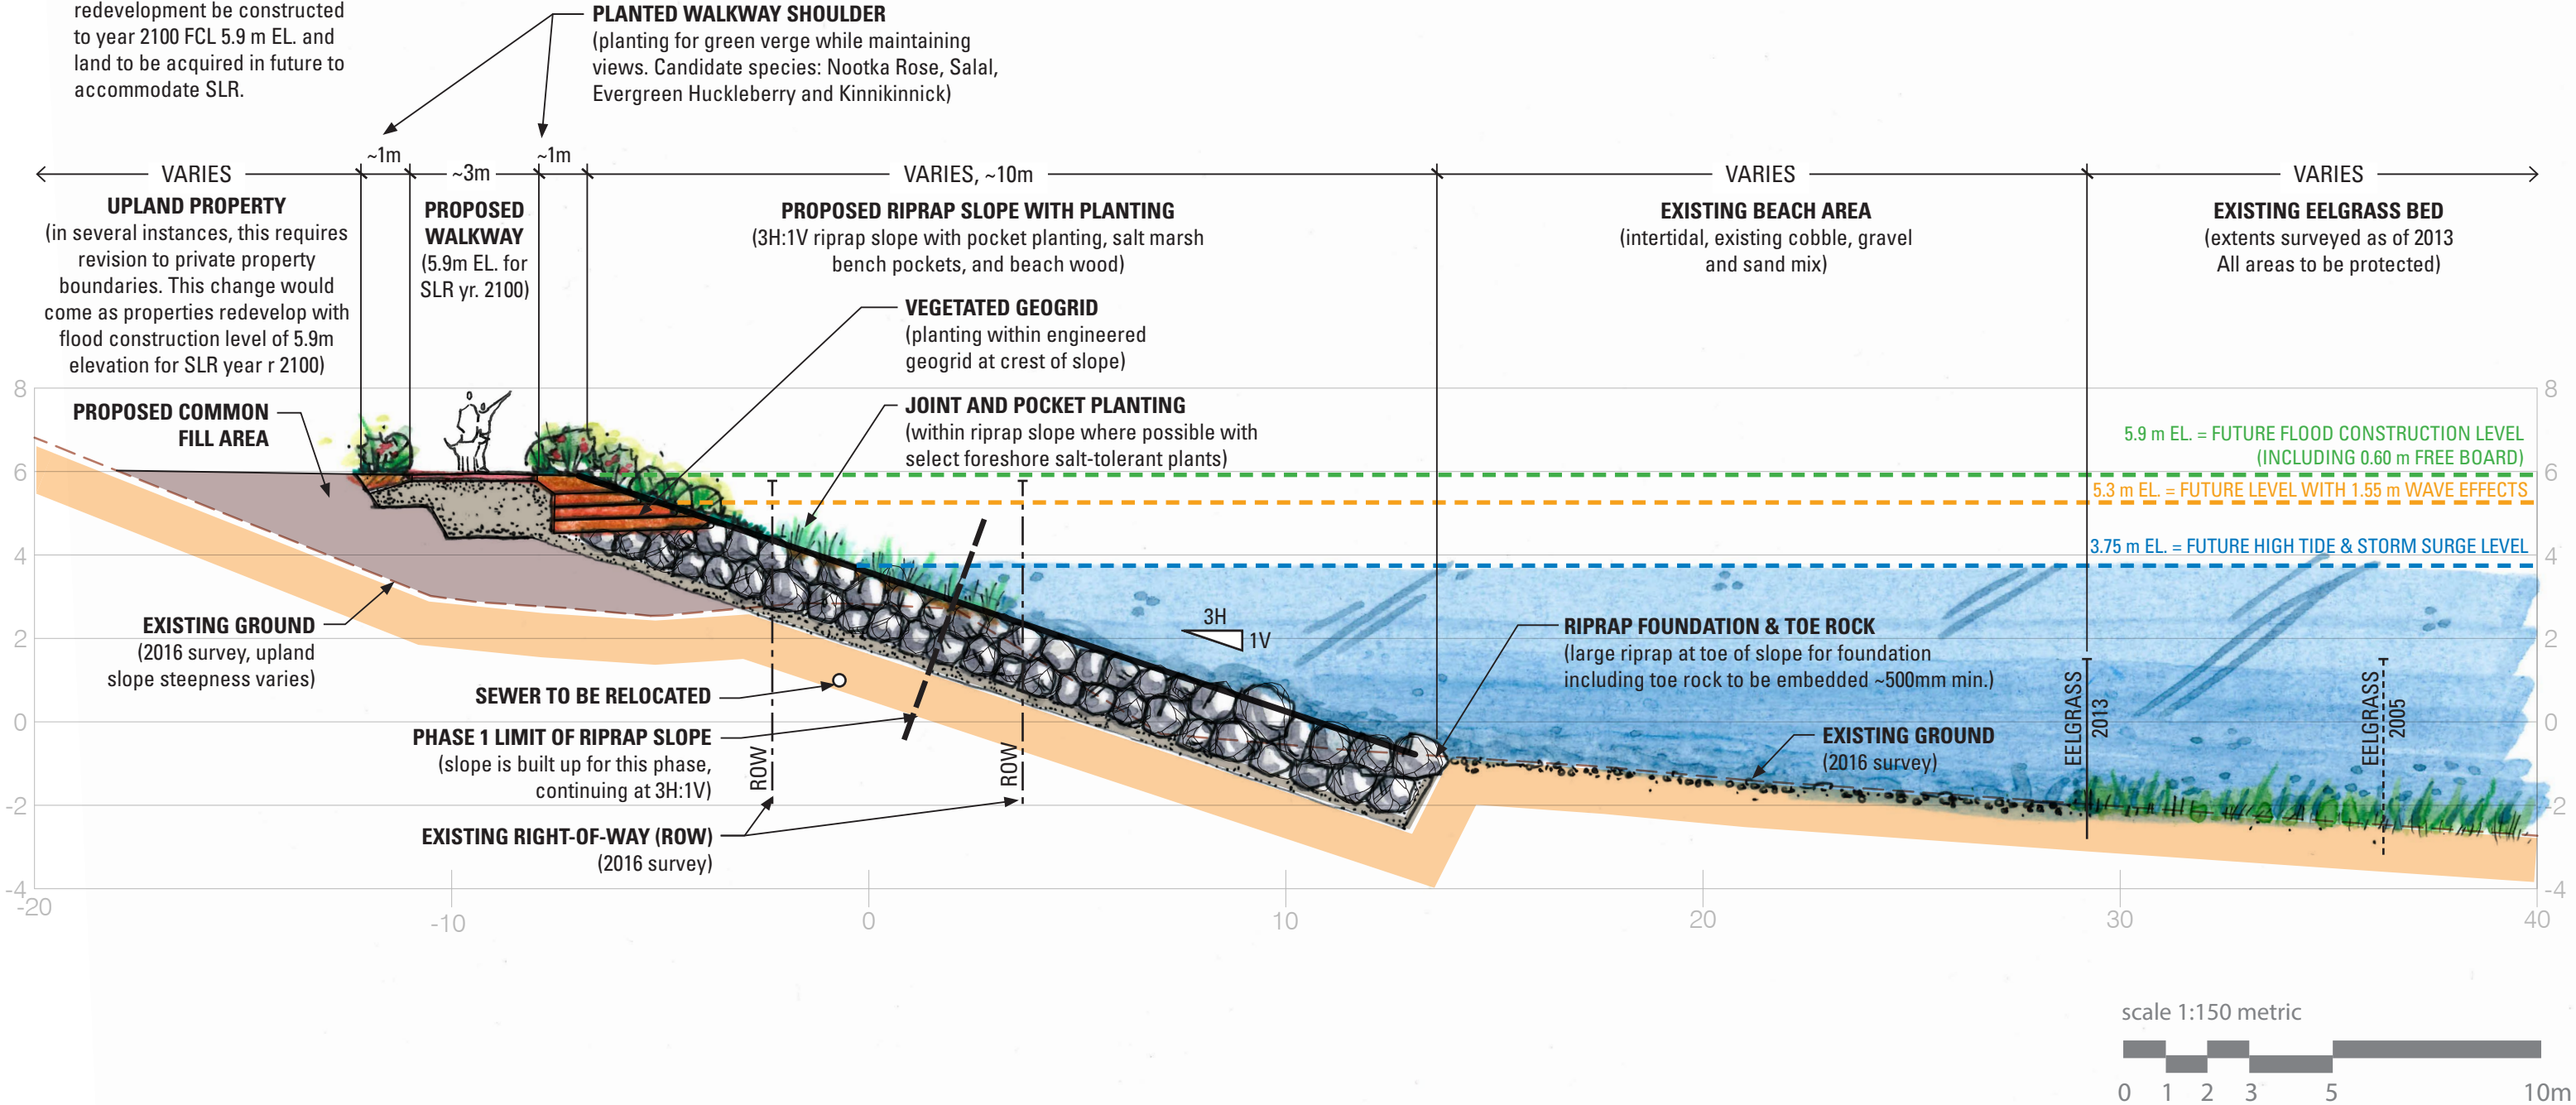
| ARMOURS BEACH SECTION - SHORT-TERM
